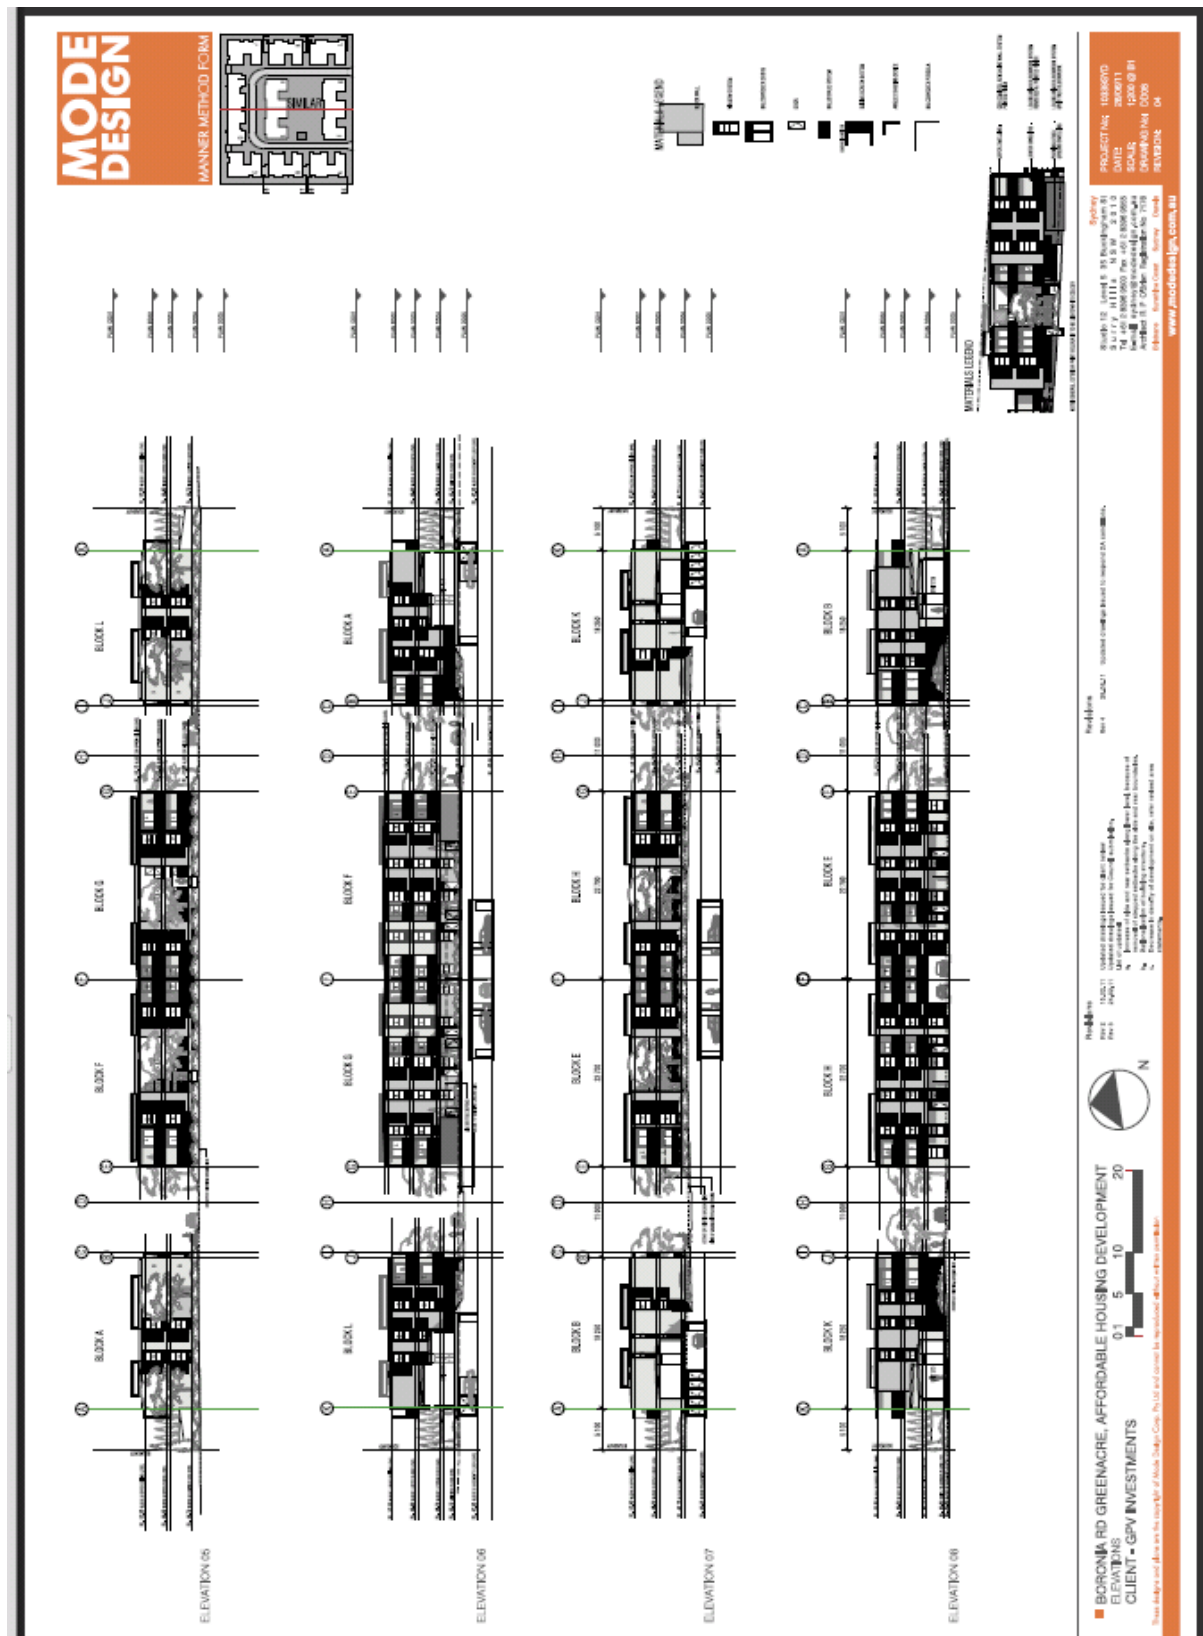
Elevations of the proposed development including Street Elevation, at top.
